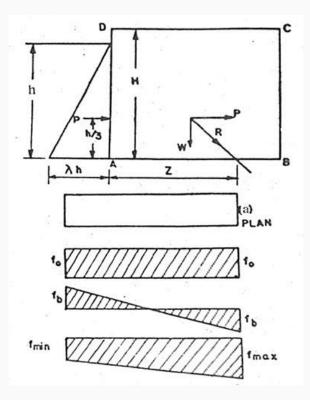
Various forces acting on the retaining wall. (Source: Suresh, 2002)
